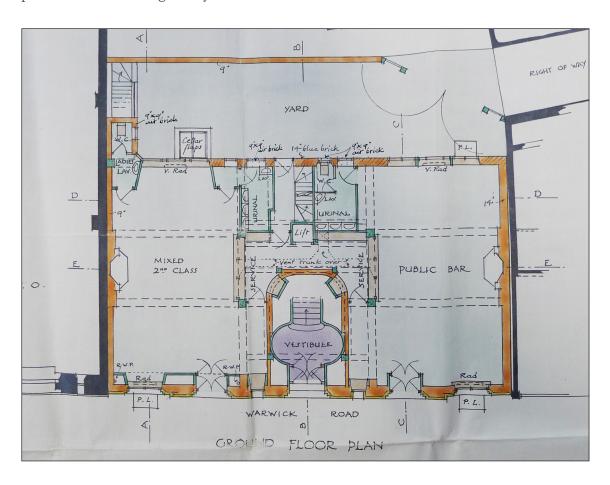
Ground-floor plan of the Crescent, Warwick Road, Carlisle, drawn in 1931 (CACC Ca/E/6/1/17 Reproduced under the Open Government Licence)
